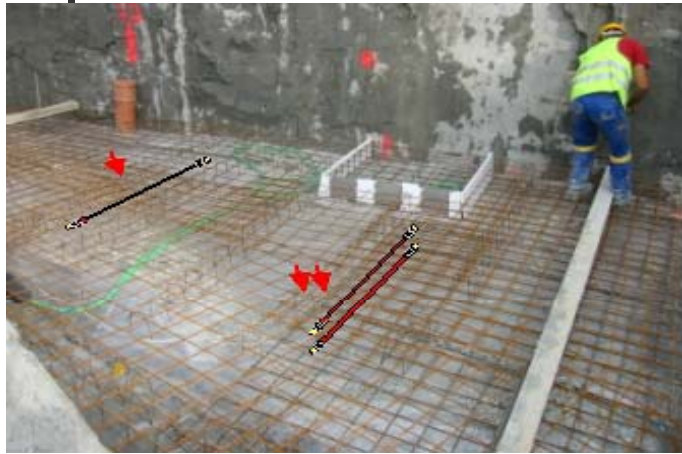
Bridge stack being prepared for destructive test, sensors installed on rebars.
